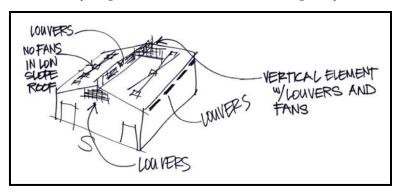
Axonometric sketch of inlet/outlet locations on the building envelope
